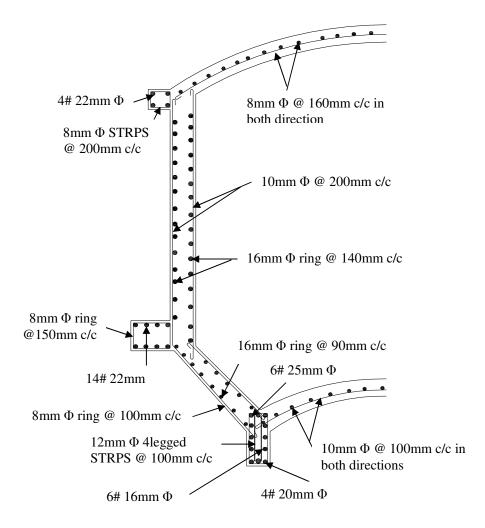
Reinforcement Detailing in Container of Frame Staging
